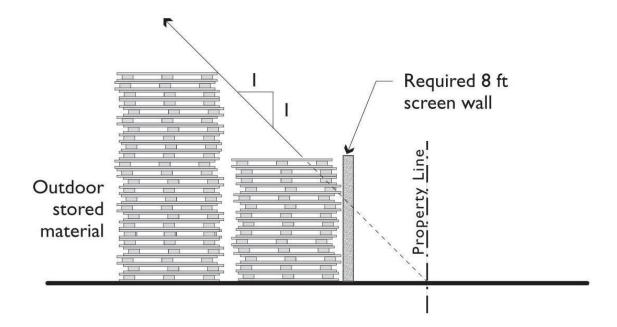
B.3: OUTDOOR STORED MATERIAL
